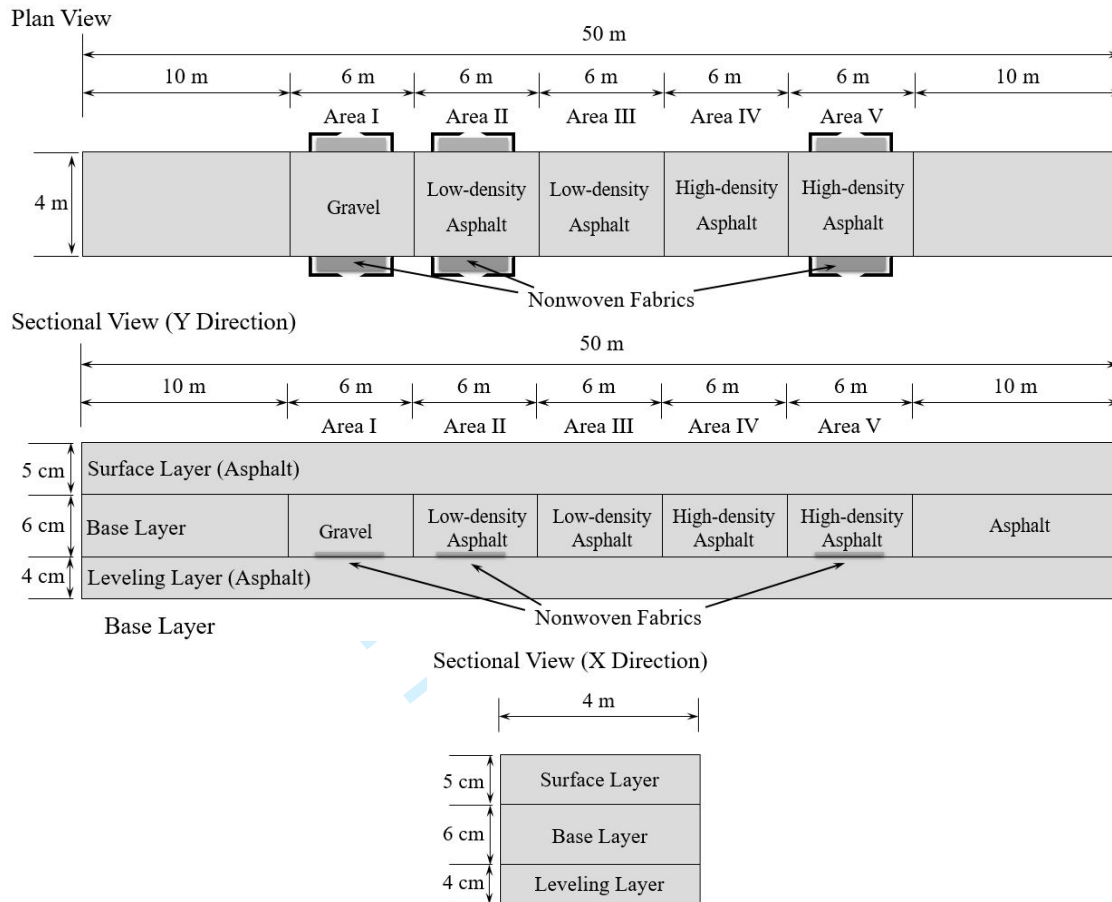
Structure layout of the airport pavement model (plan view and sectional view (X and Y Direction)).
